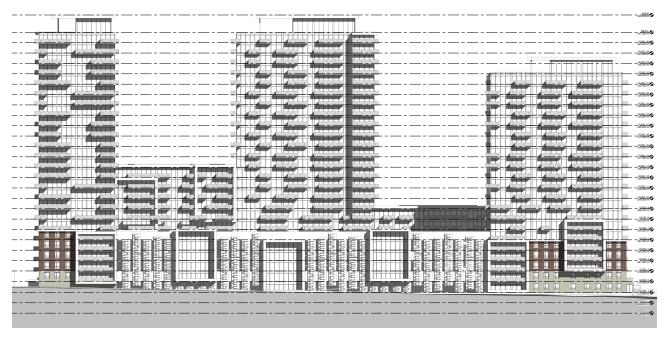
North Elevation, Building 1, prepared by SRM Architects.
